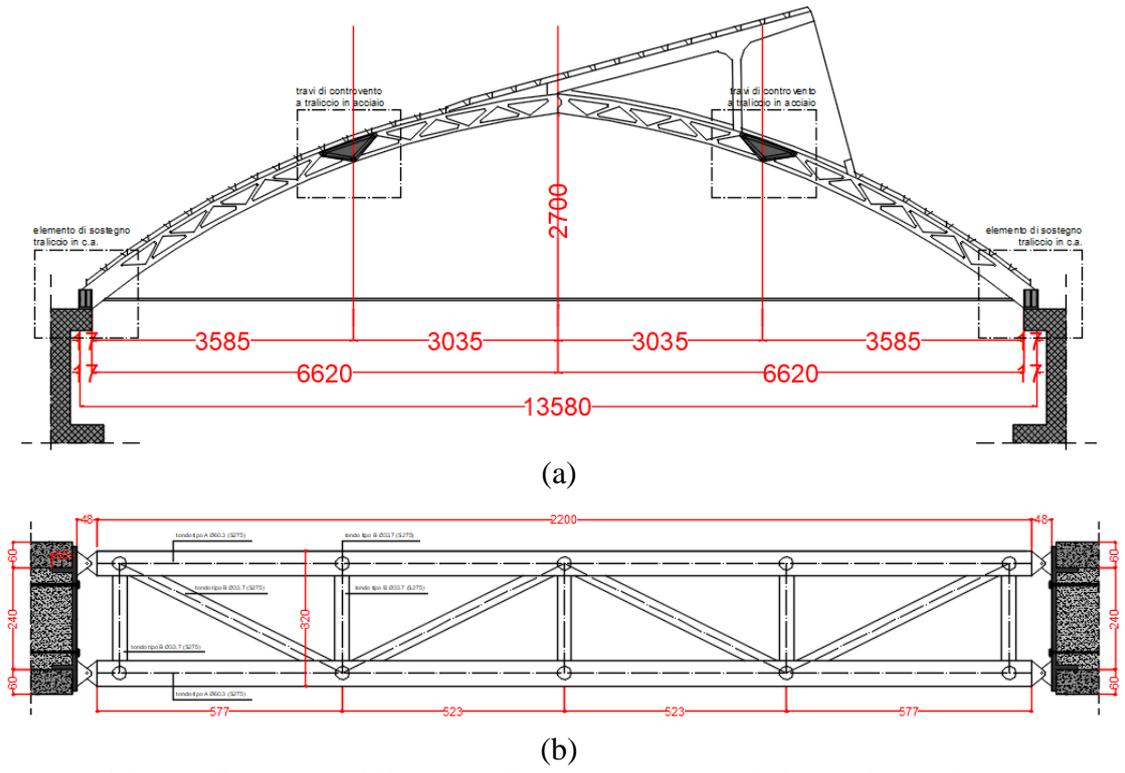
(a) Section of RC truss arch structures of roof; (b) steel truss beams as lateral force system in roof.
